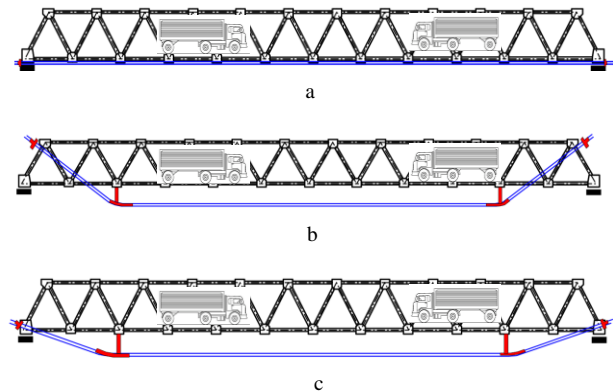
Examples of the placement of cables that may be used in steel truss bridges: a) Type 1; b) Type 2; c) Type 3.
